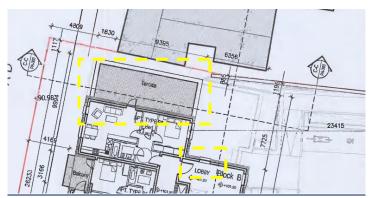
BLOCK B'S NORTH ELEVATION'S 4TH STOREY LARGE TERRACE & FULL HEIGHT WINDOW
